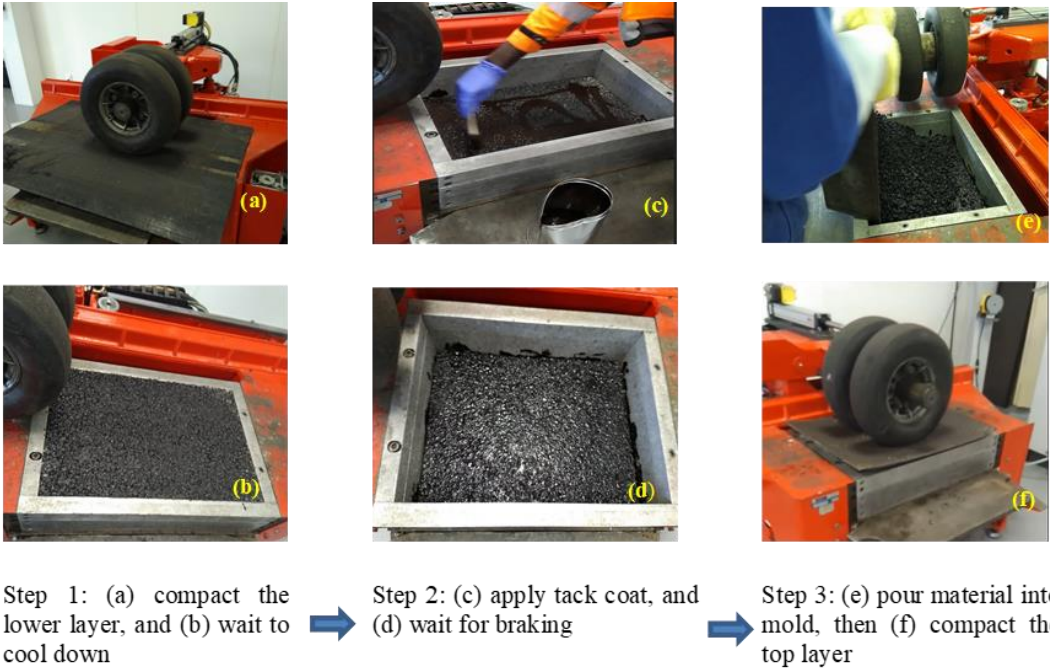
Double-layer slab fabrication in laboratory using a French wheel compactor
